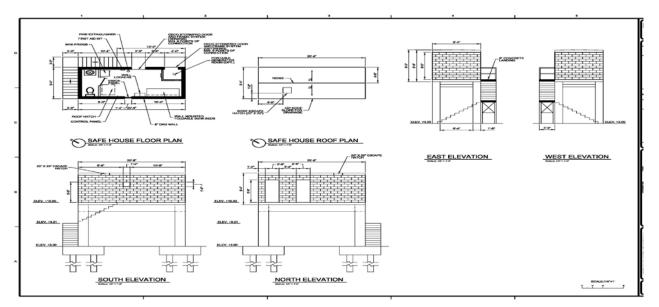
Typical emergency shelter/safehouse vertical design for St. Mary's Pump Station
